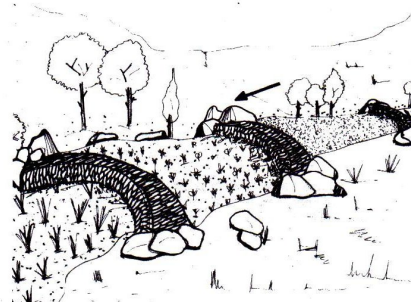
Construction of successive barriers Source: Paraiba (1994)
